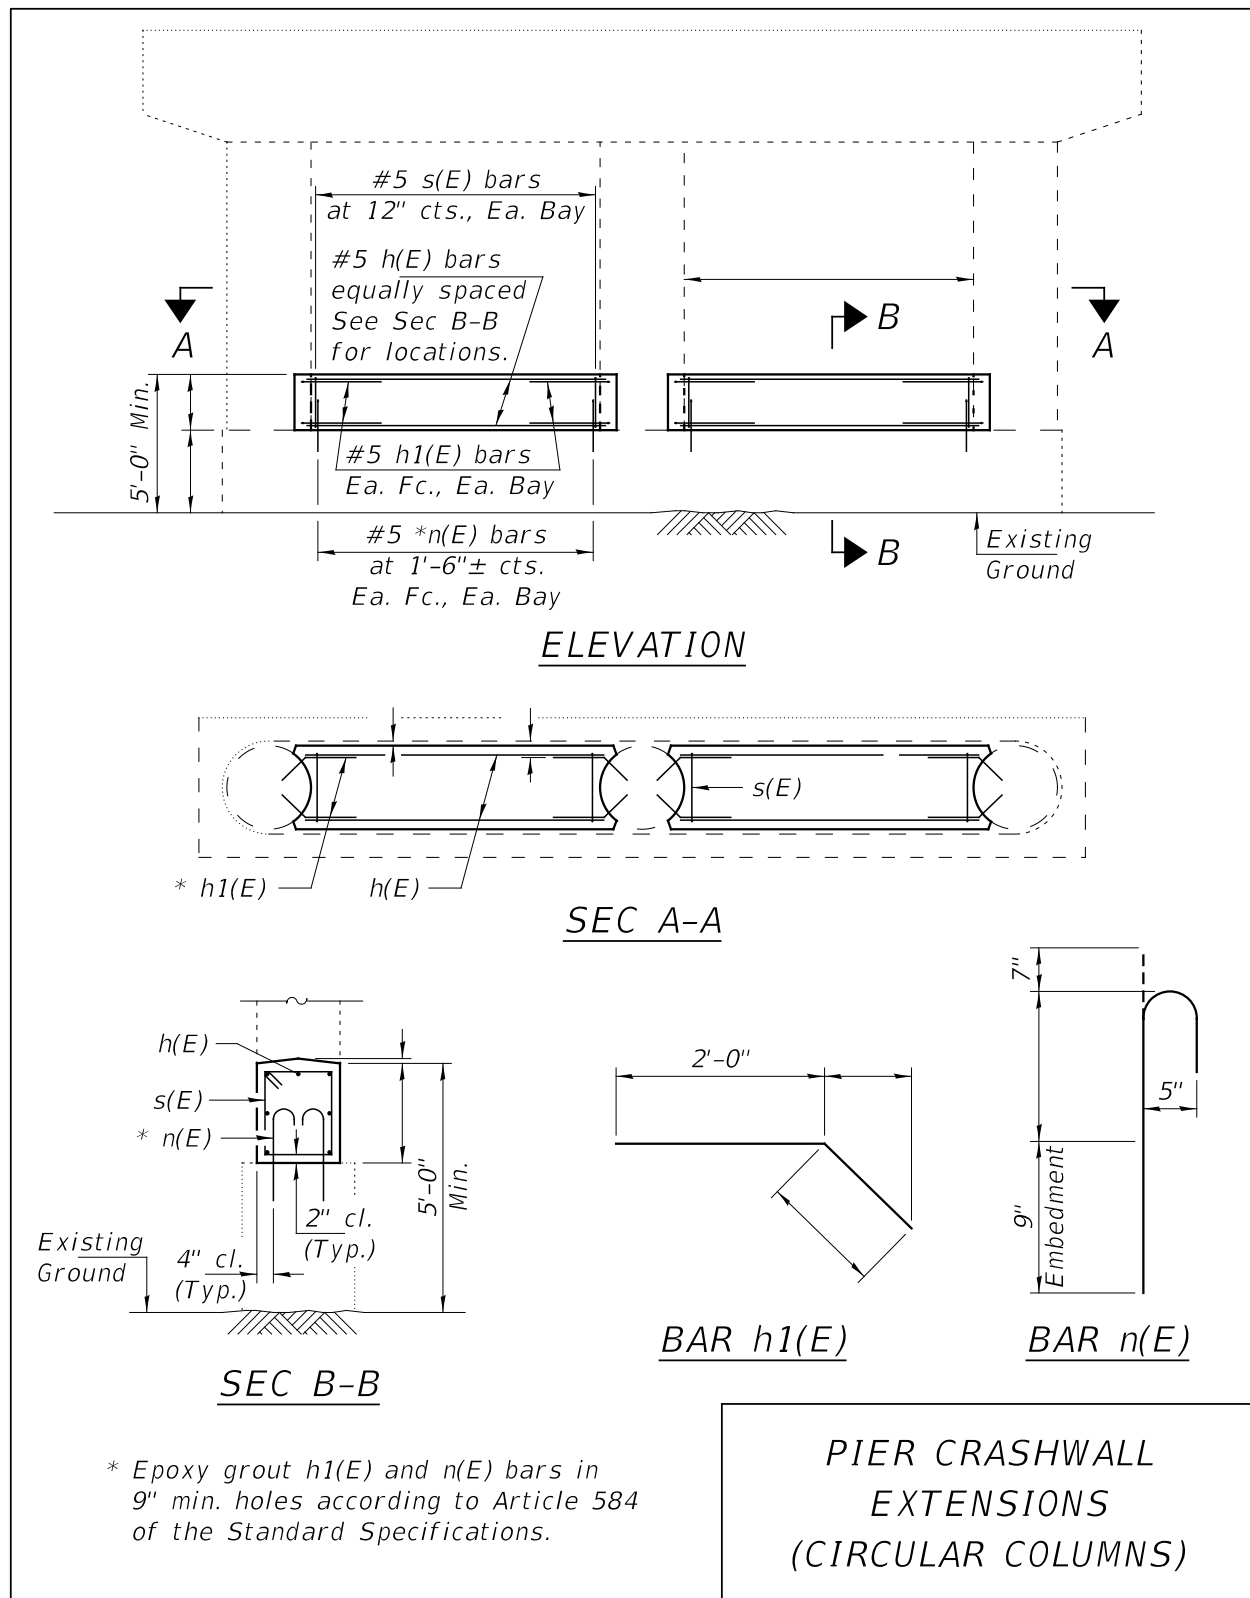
Pier Crashwall Extensions (Circular Columns)
